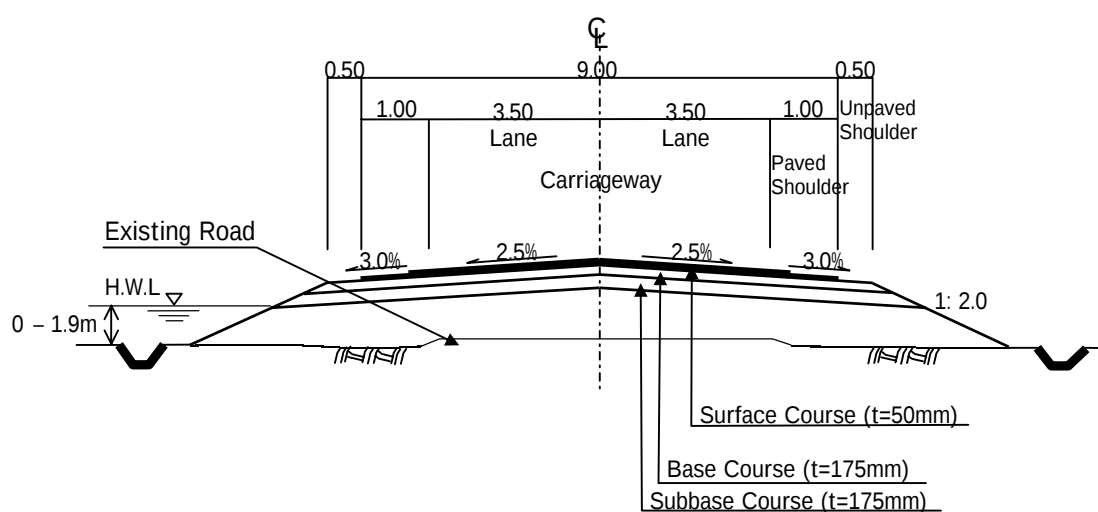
Typical Cross Section for Alternative 2 (L = 6.40km)
